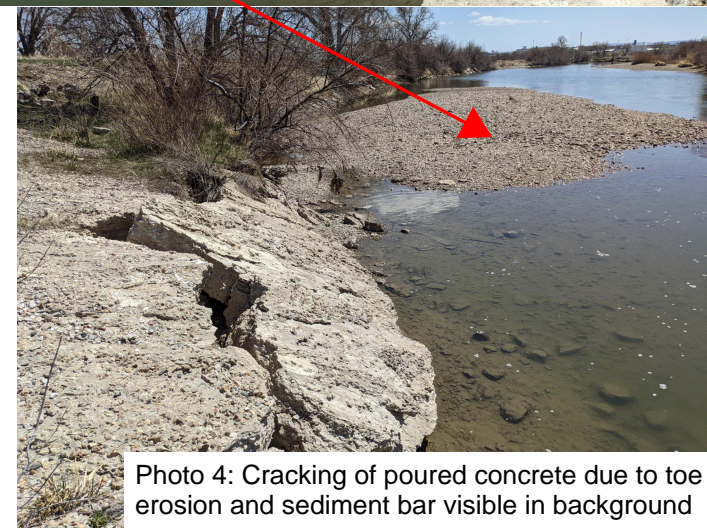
Cracking of poured concrete due to toe erosion and sediment bar visible in background
